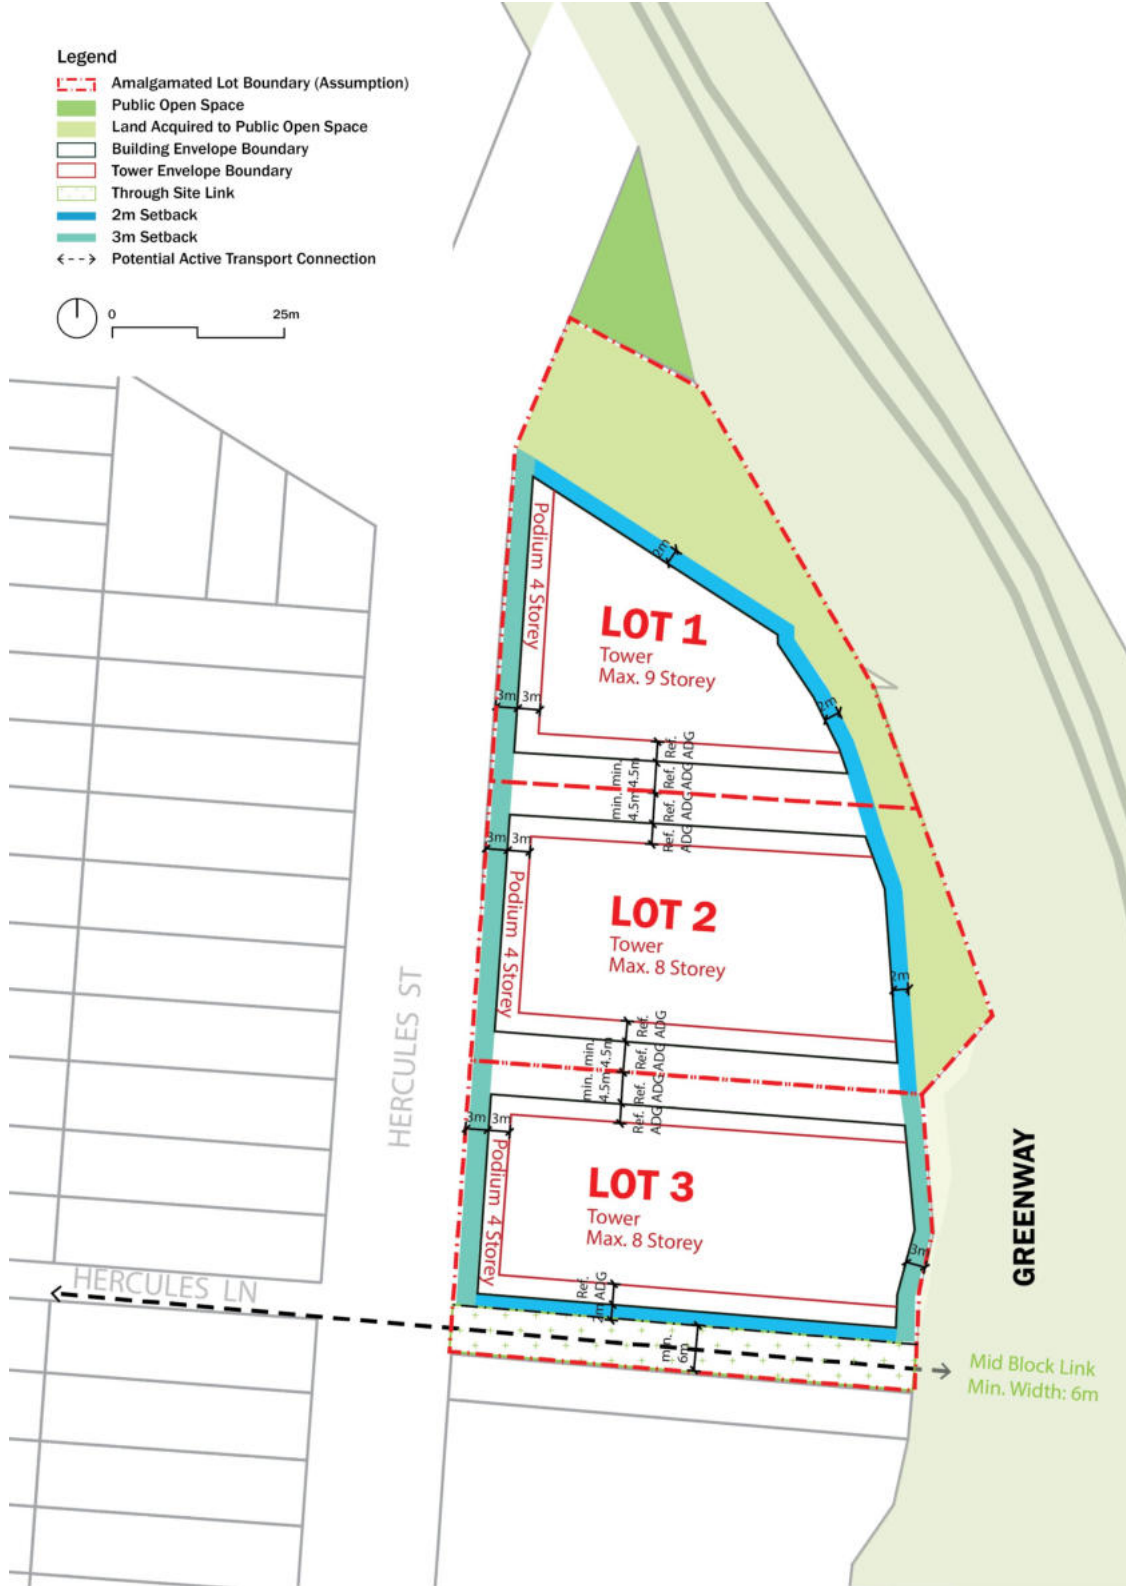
Dulwich Hill Station – 45-71 Hercules Steet Key Sites Plan
